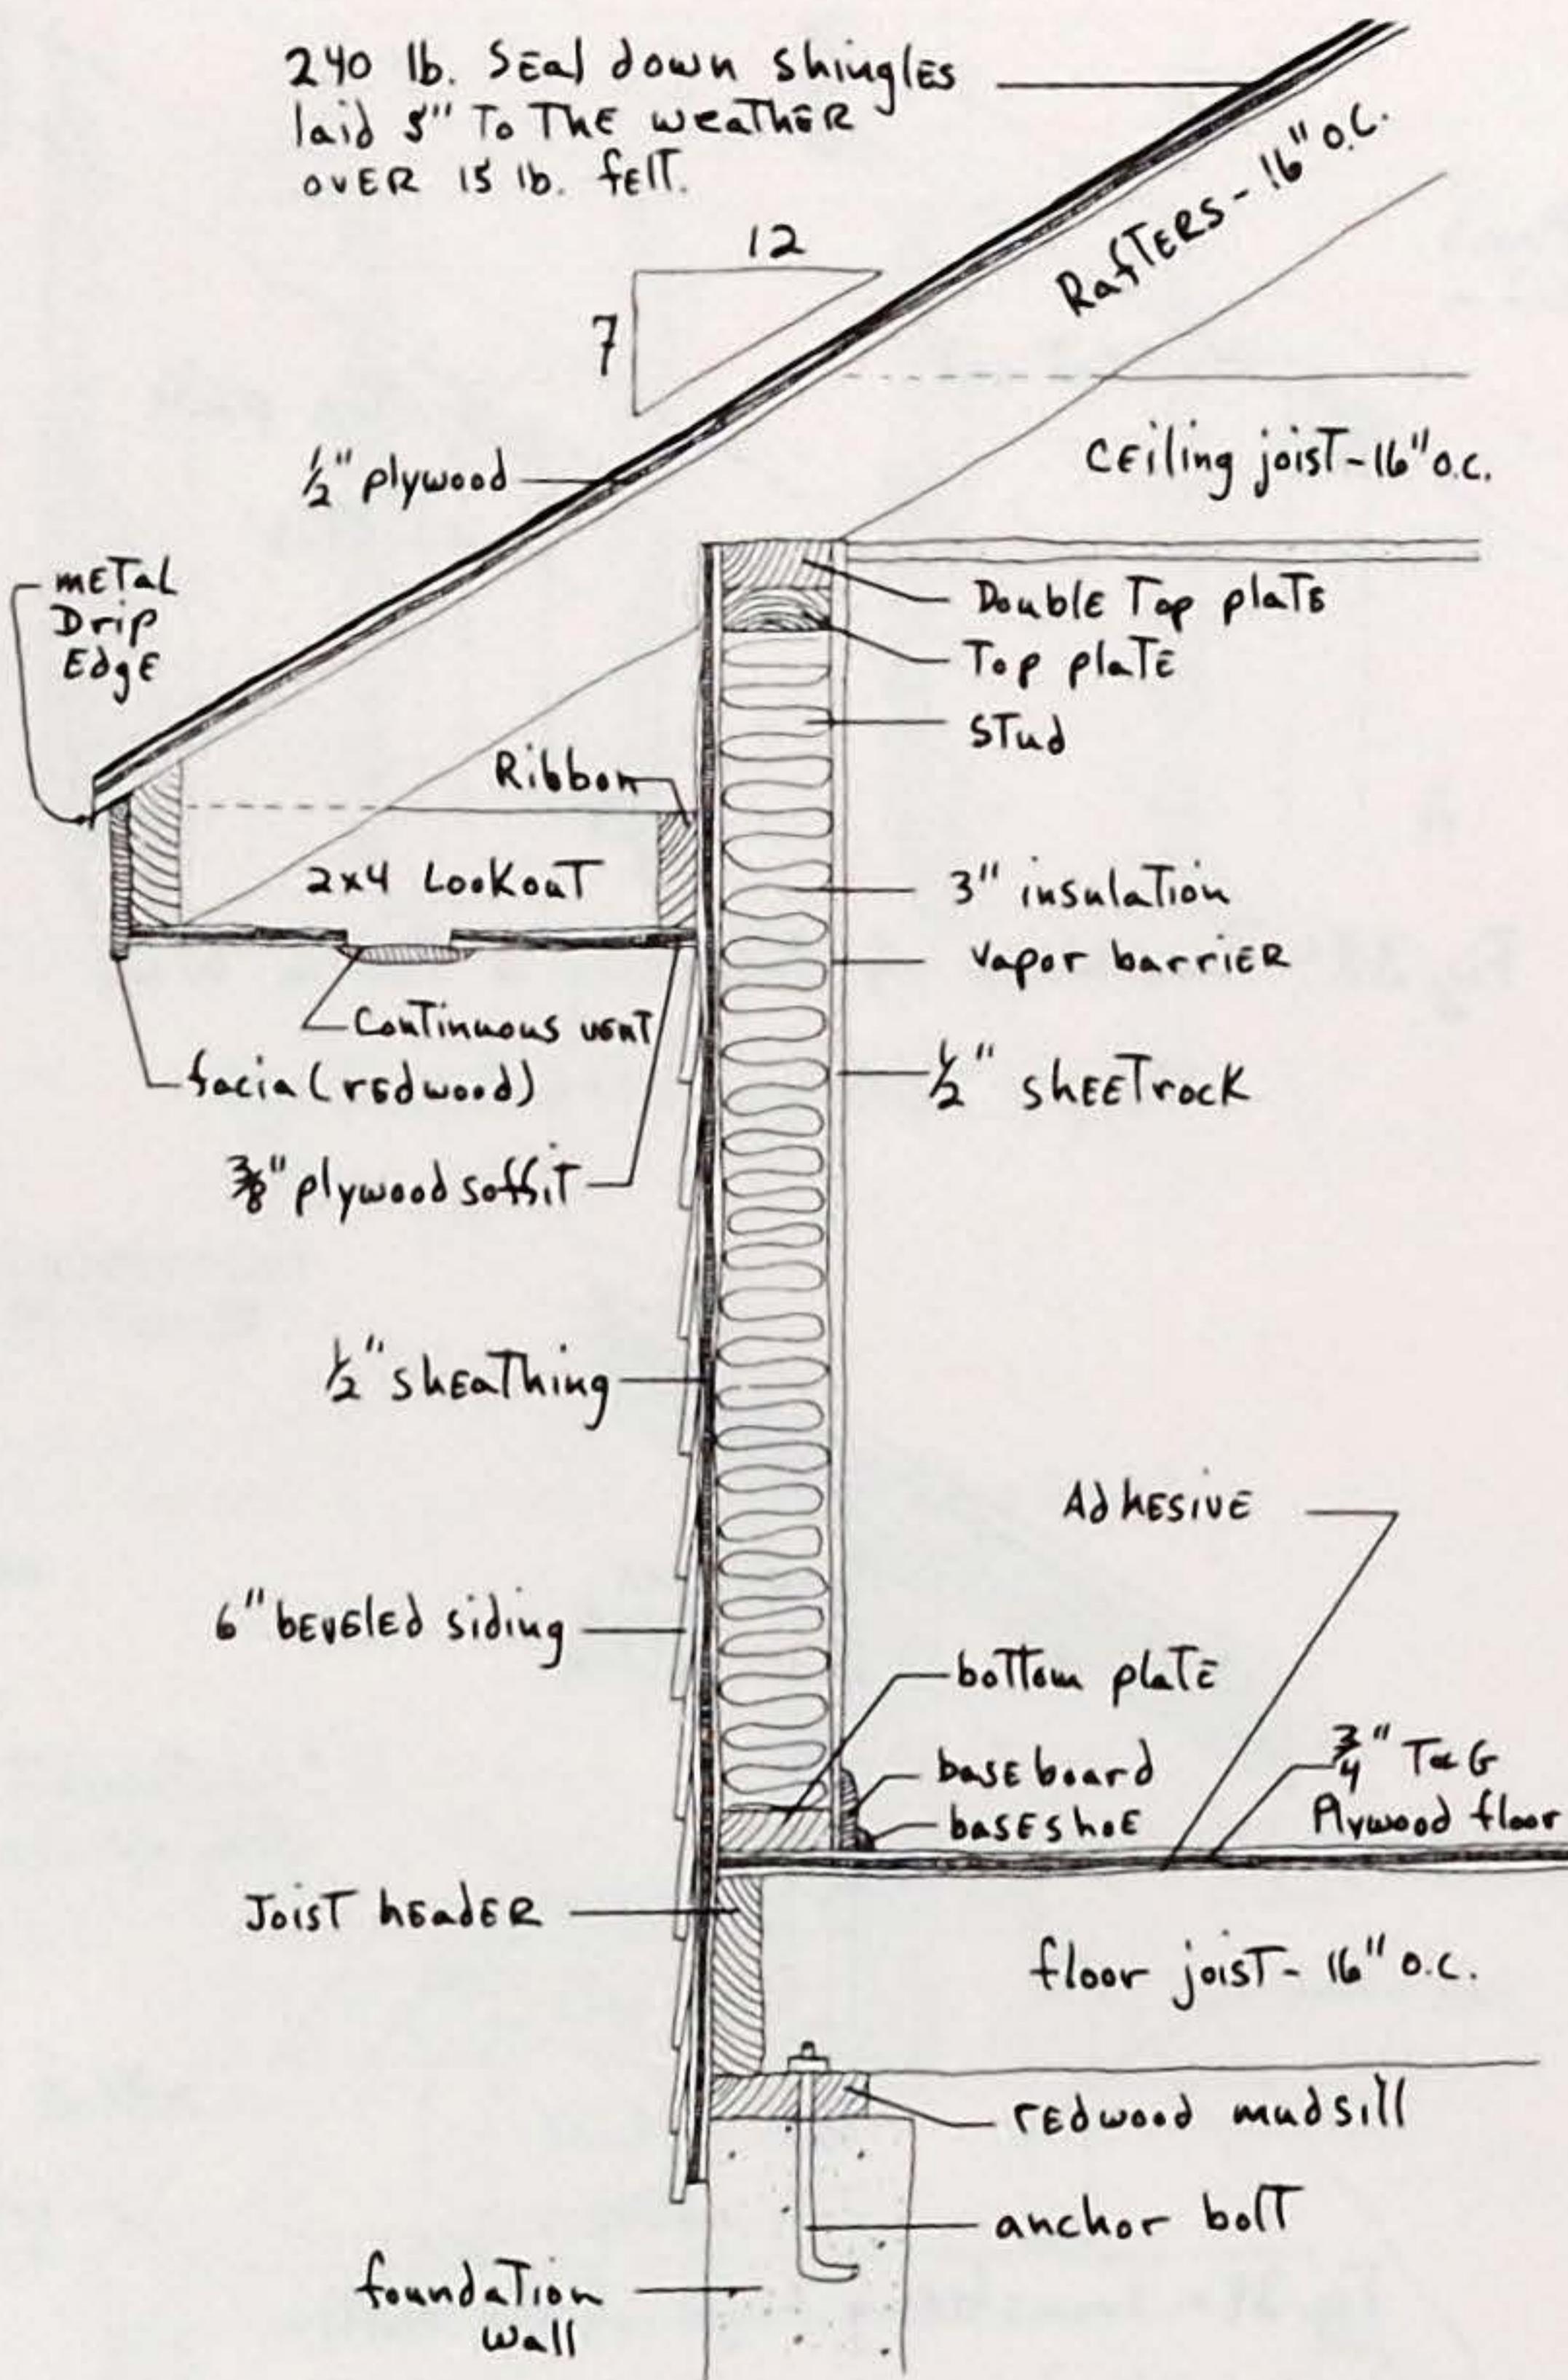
Cross section of foundation, Wall & Roof with Cornices
